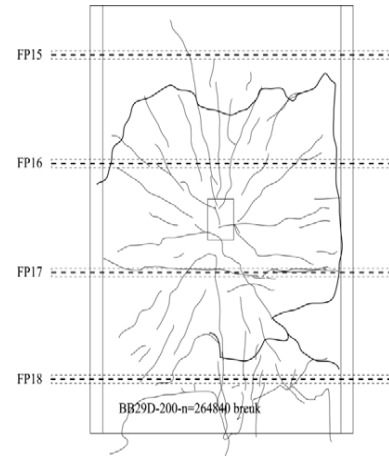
Crack pattern at failure, fatigue test no. 3 [15]
